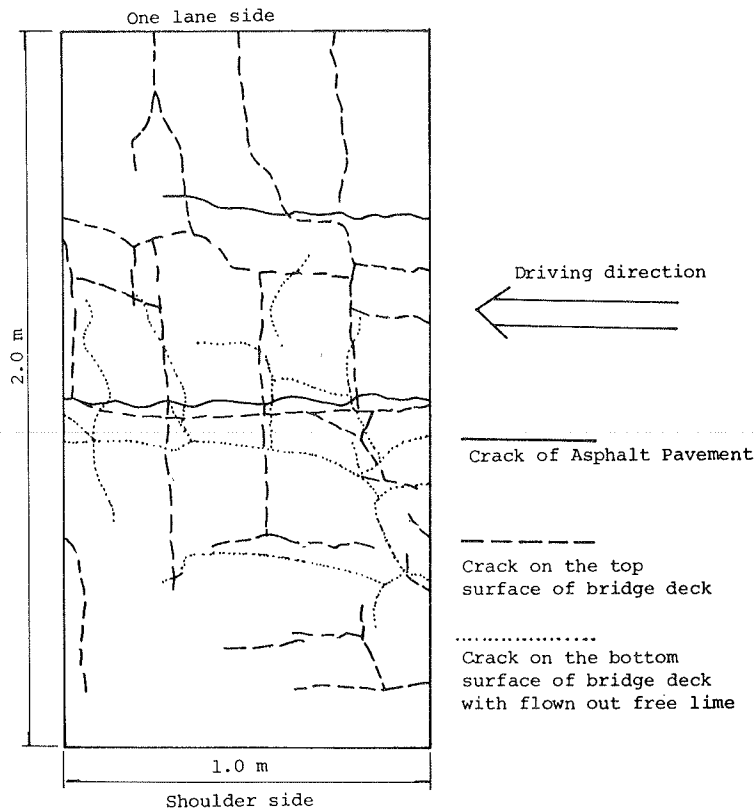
Typical crack pattern of deteriorated bridge deck in service.
